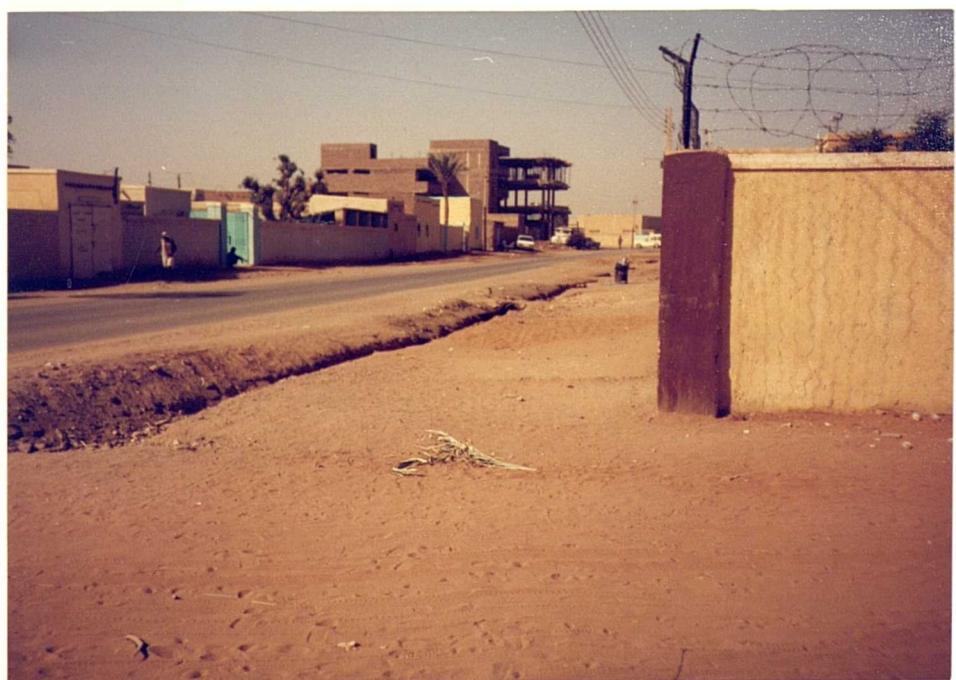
A Eddoma asphalted road that divides Al-Umda Sharque into north and south halves. No greenery nor pavement on the sides. Note the untidy storm water trench.
